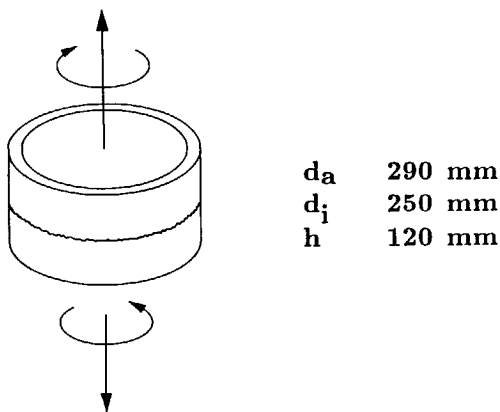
Hollow cylindrical specimen adopted by Keuser & Walraven⁸⁸.
